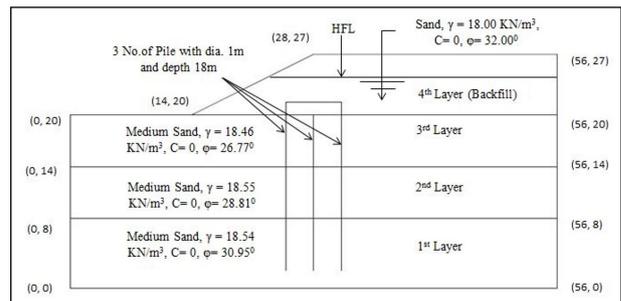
Sample Model of Katnu Khola River Bridge Abutment-1
